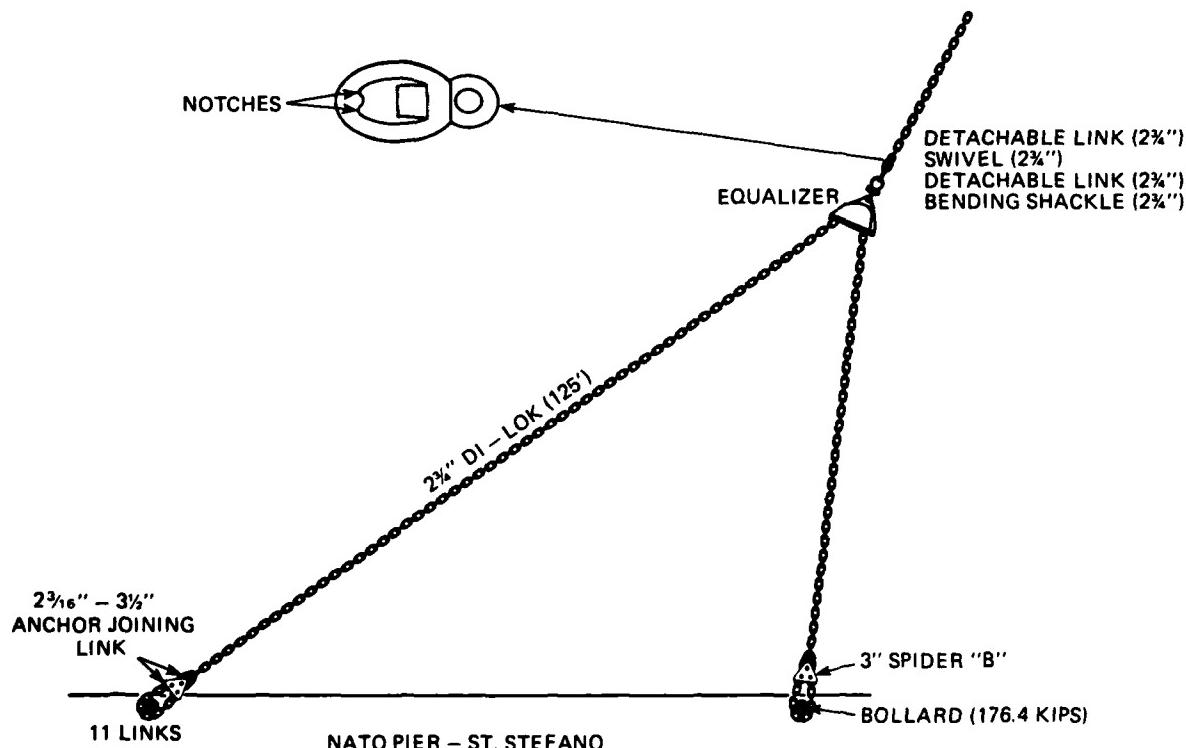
La Maddalena Fleet Mooring, Stern Leg Assembly
